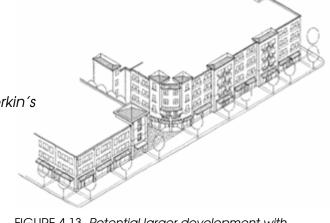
Potential larger development with wide sidewalks and pedestrian access
